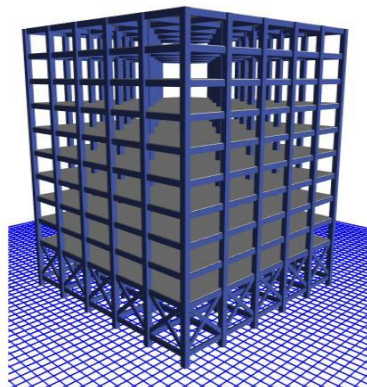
Soft Storey at First Storey with Shear Walls at Core
